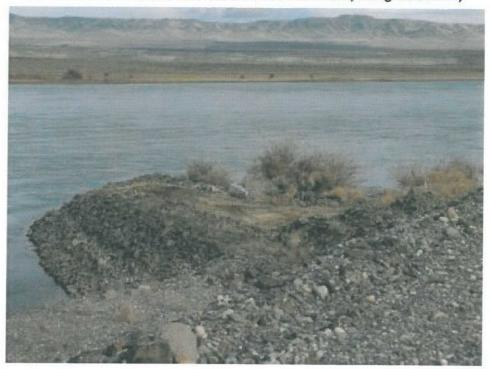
Northern anchor block area after rip rap replaced (facing northwest).
